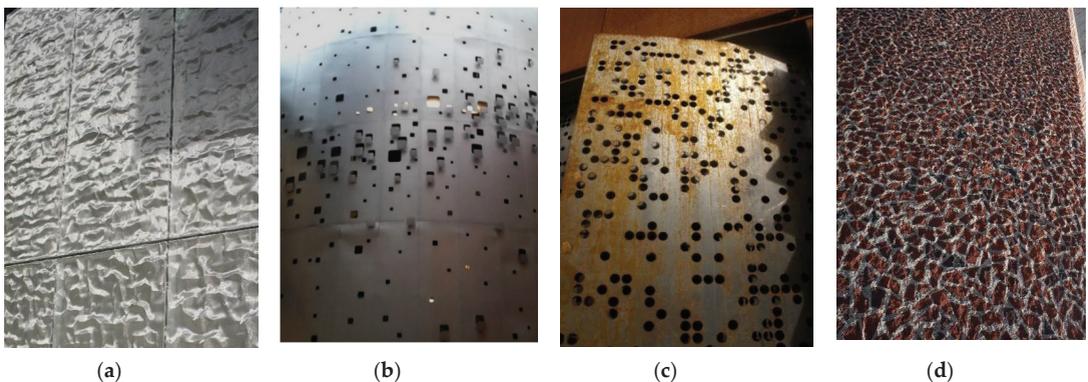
Application of ADAD concept in relief composition of building enclosure; (a) Façade cladding in wrinkled steel mesh, pavilion, EXPO Milan, 2015 (Photo by M. Celadyn); (b) Inner courtyard walls' cladding with perforated stainless steel sheeting, Stary Browar (Old Brewery) Commercial Center, Poznan, Poland, arch. ADS Studio, R. Kaja, 2007 (Photo by W. Celadyn, 2014); (c) The external pivoting doors with perforated steel and stains from the Corten-finished walls' cladding, British pavilion, EXPO Milan, 2015, (Photo by M. Celadyn); (d) External wall cladding with *picado* technique, CKK Jordanki Congress and Culture Centre, Torun, Poland, arch. Menis Arquitectos, 2015 (Photo by M. Celadyn).
